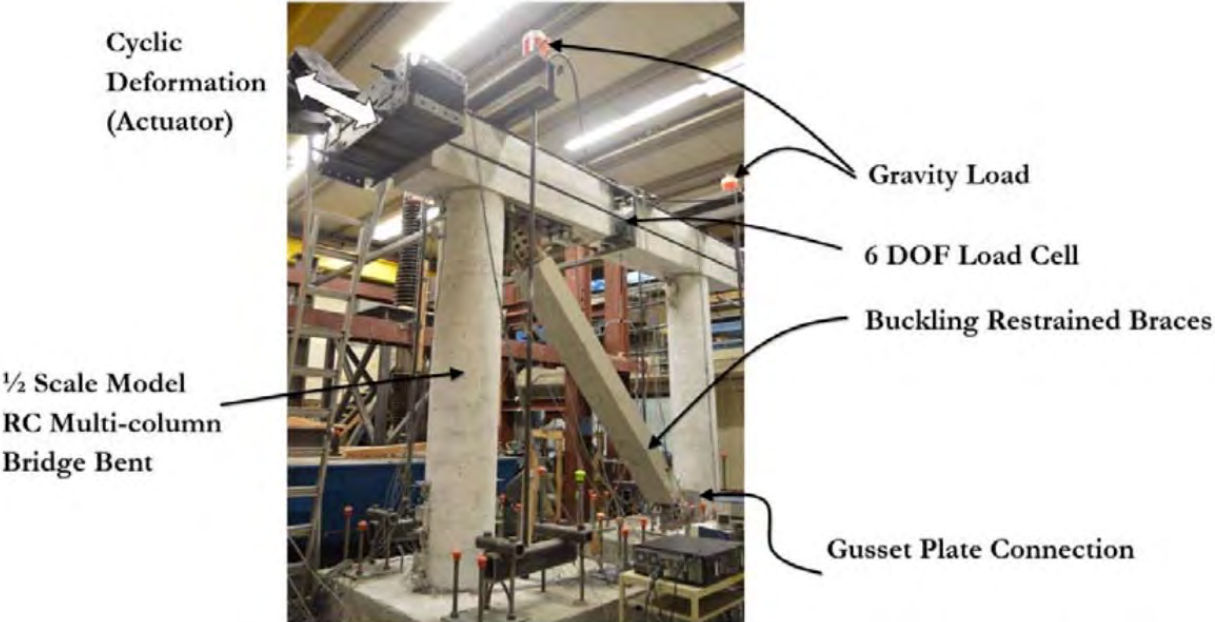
Test setup of the half-scale concrete bridge bent with BRBs (Dusicka et.al., 2015)
